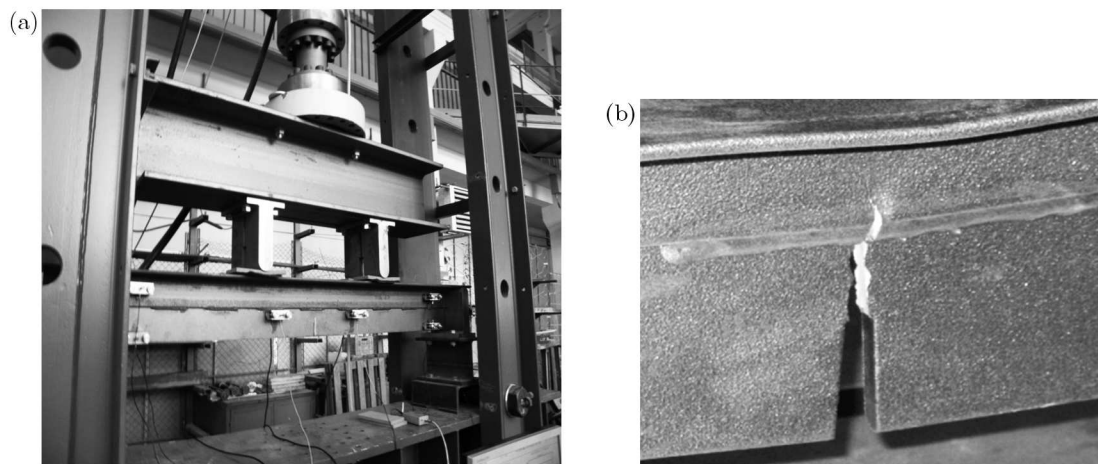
The test stand with a welded beam (18G2A steel) with a narrow cut-out in the centre and acoustic sensors mounted on it (a) and cracked the beam section (b)
